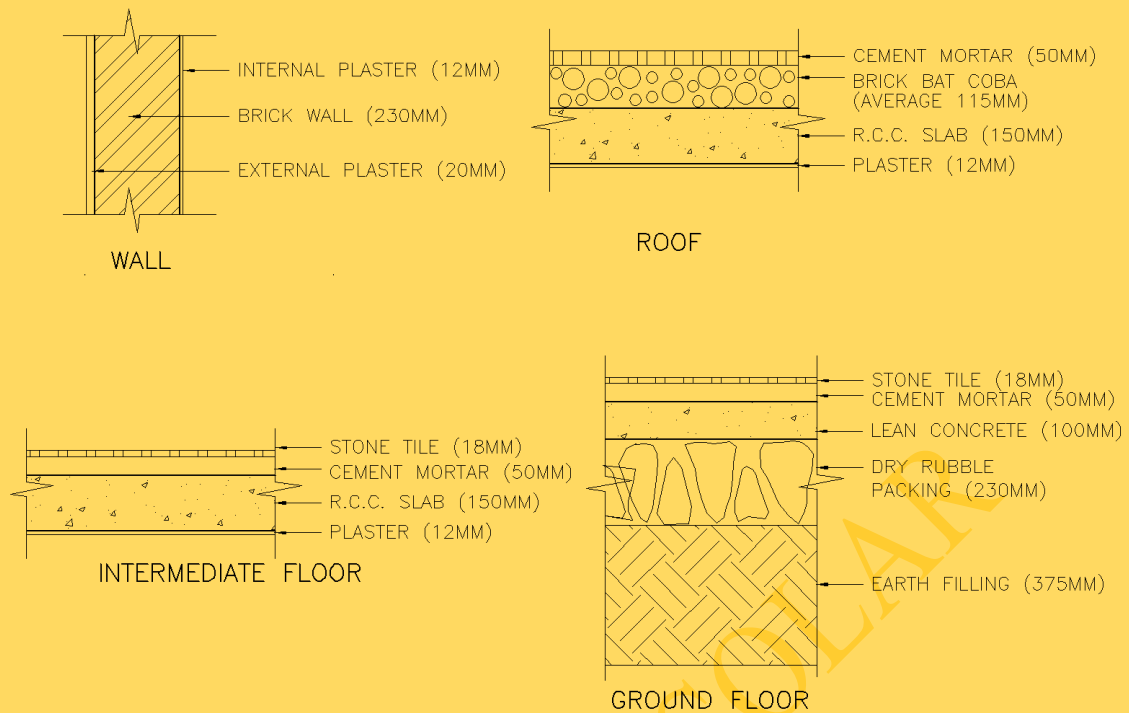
Cross section of typical wall, roof and floor of the industrial building and residential bungalow
